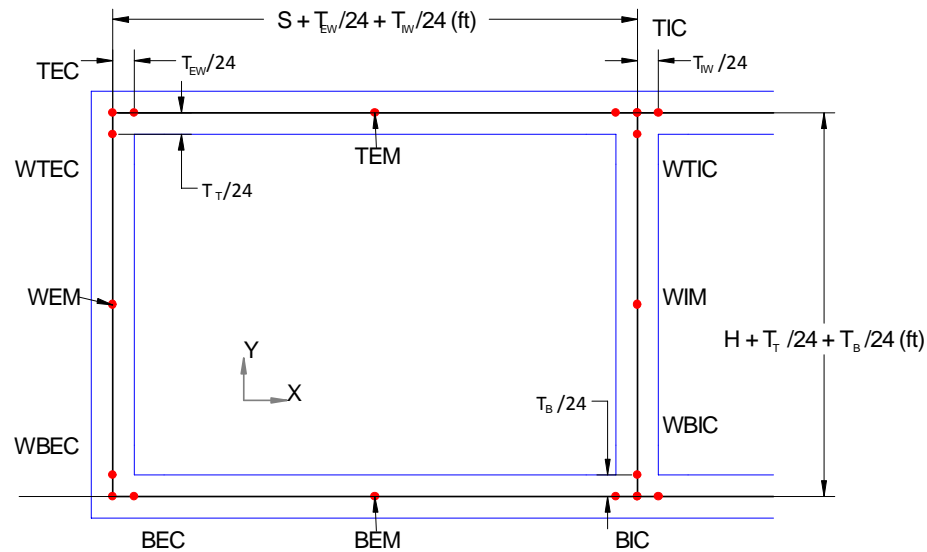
A MODEL DIMENSIONS FOR A LEVEL 1 ANALYSIS FOR CULVERTS WITHOUT HAUNCHES.
